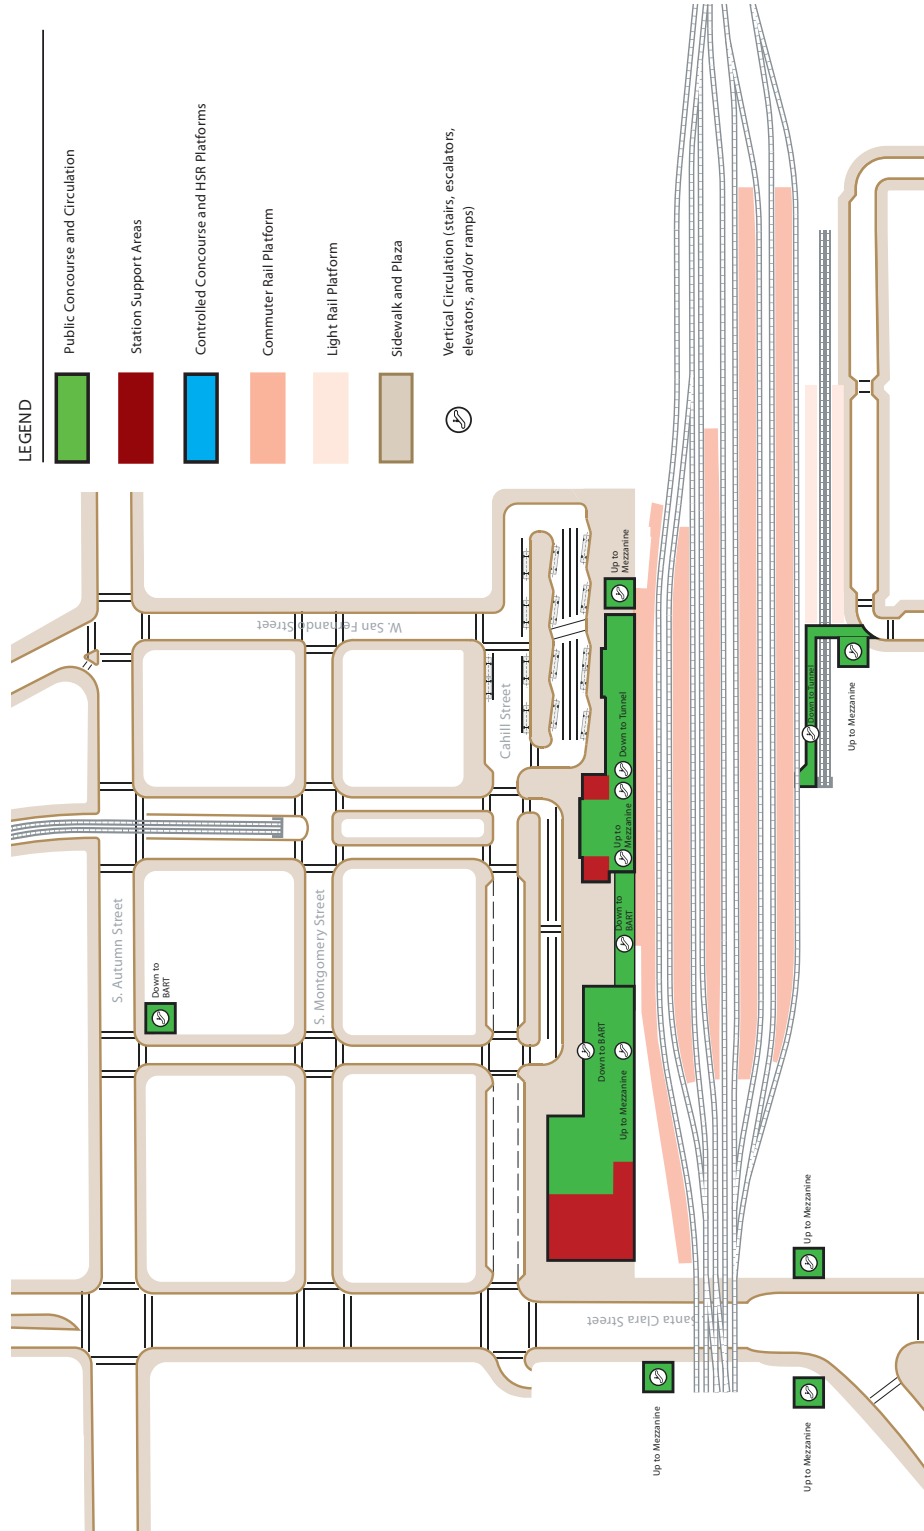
STATION STREET LEVEL ALTERNATIVE PLAN
